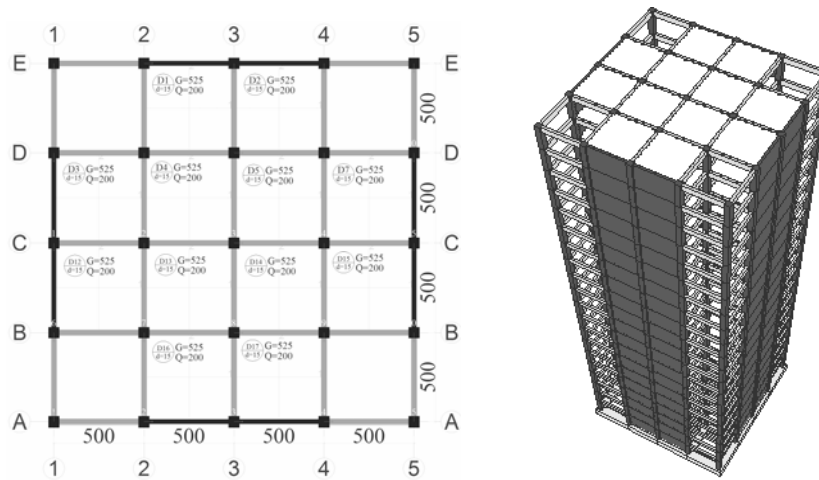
Structural plan and 3D view of parametric model IIIa
